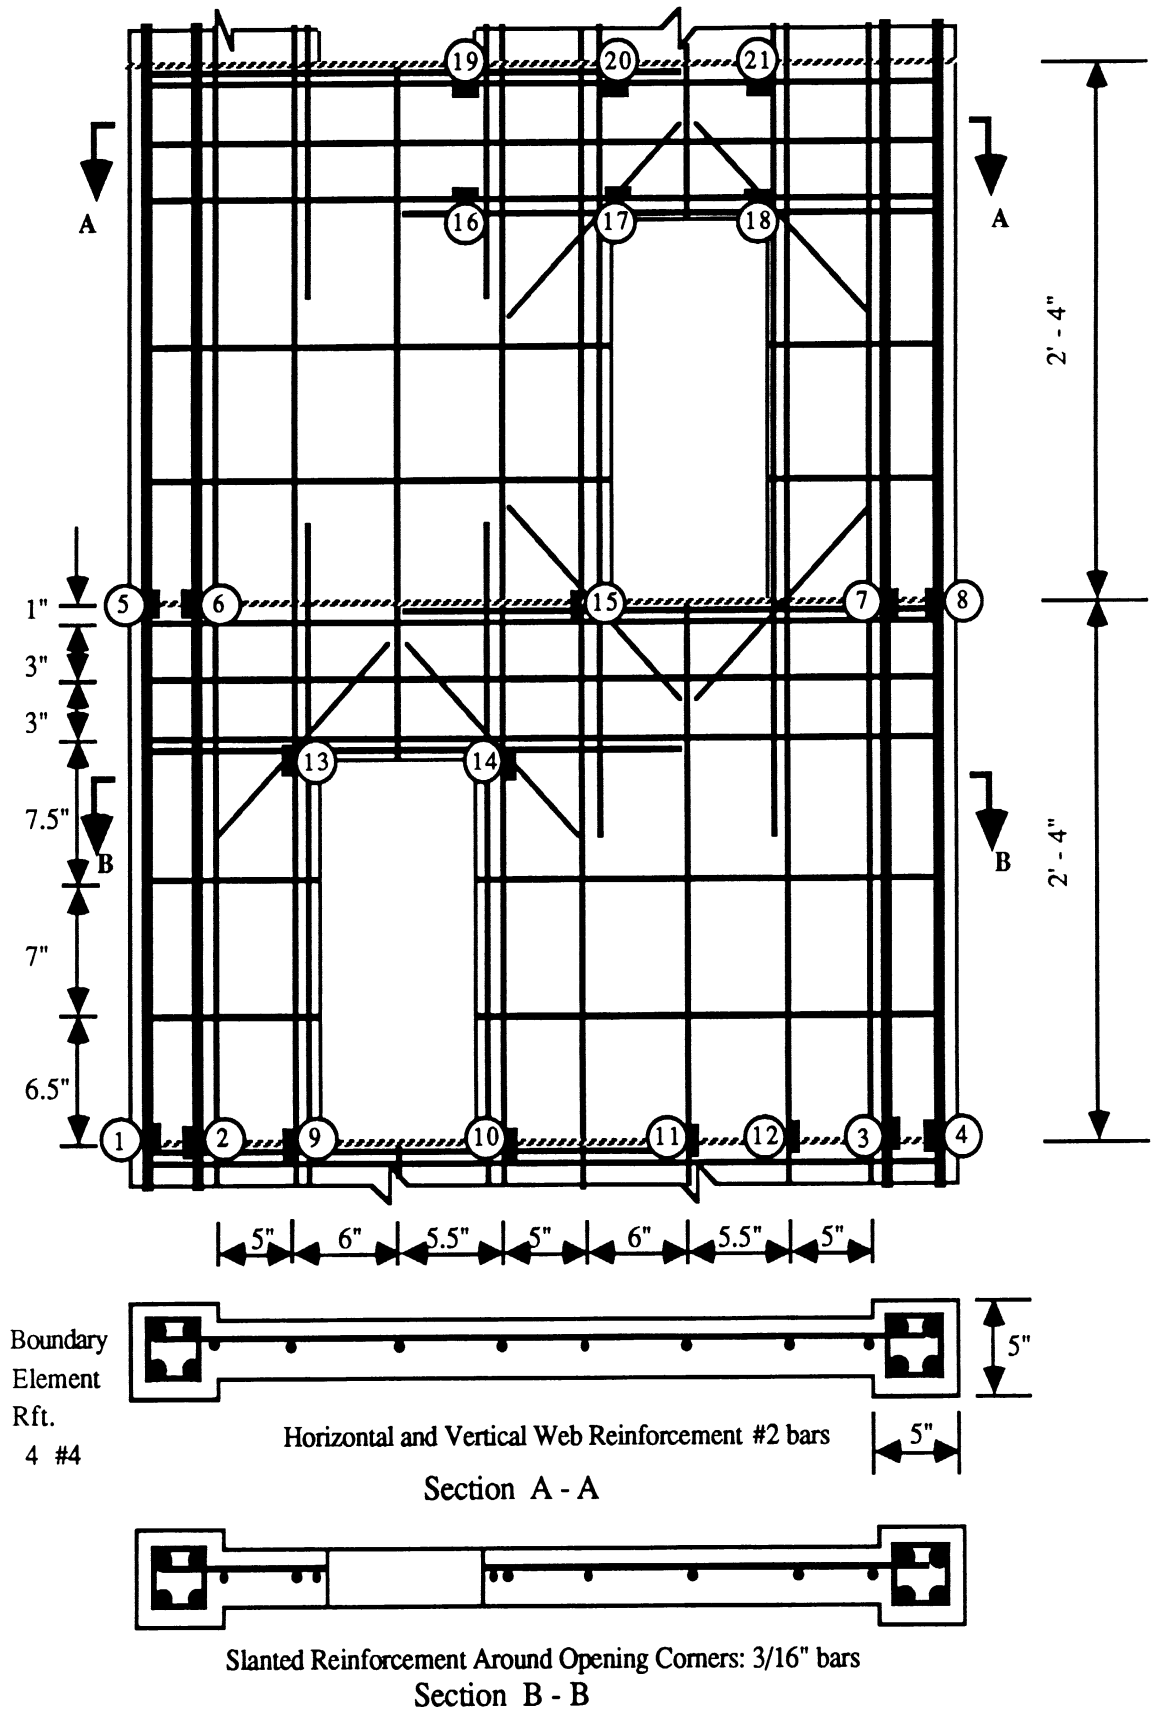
(c) : Wall Elevation with Gage Locations and Cross Sections of Specimen W-3.
